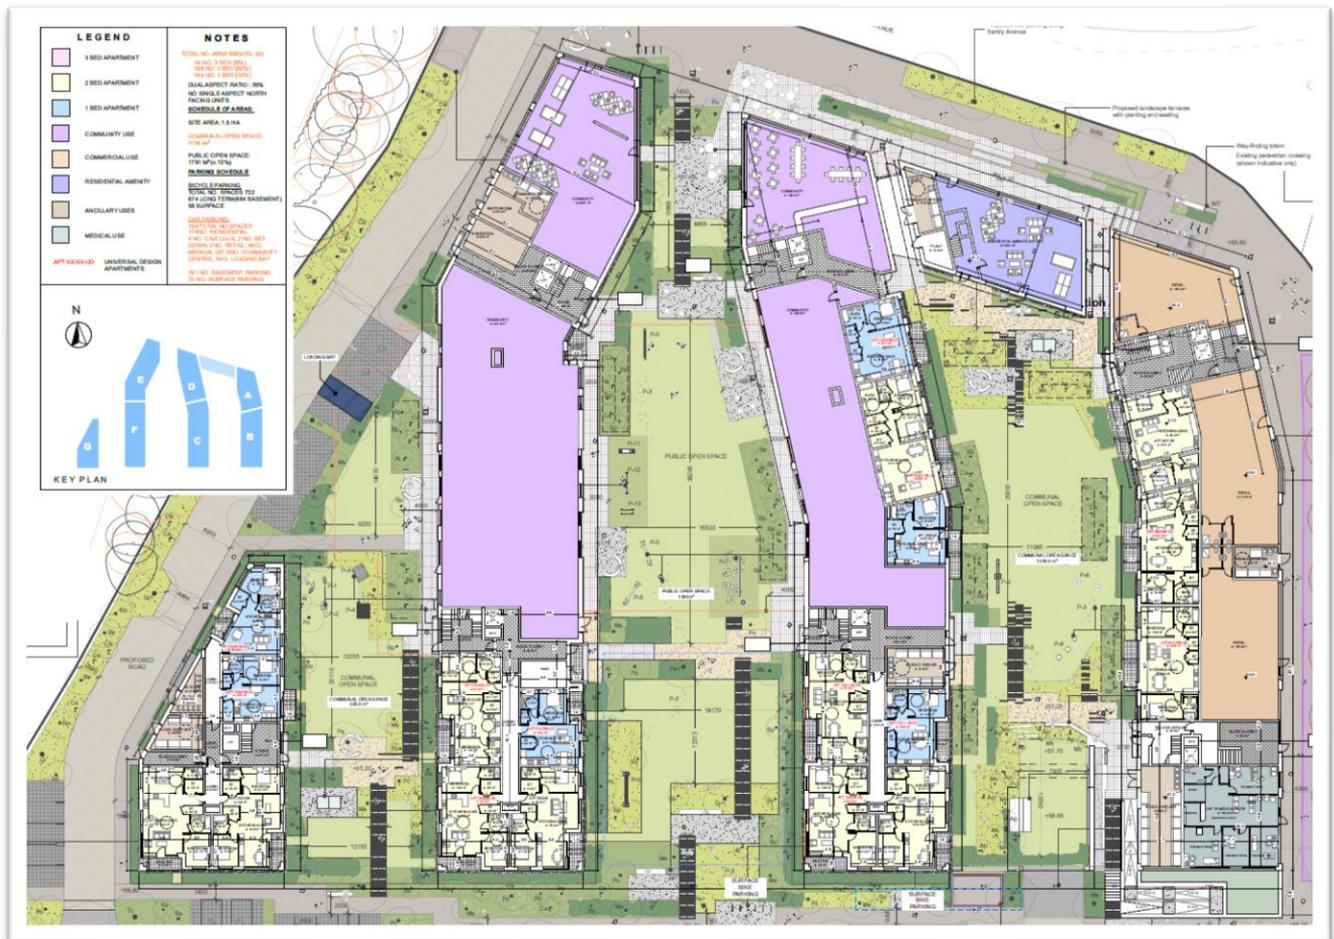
Proposed Site Layout / Ground Floor Plan
